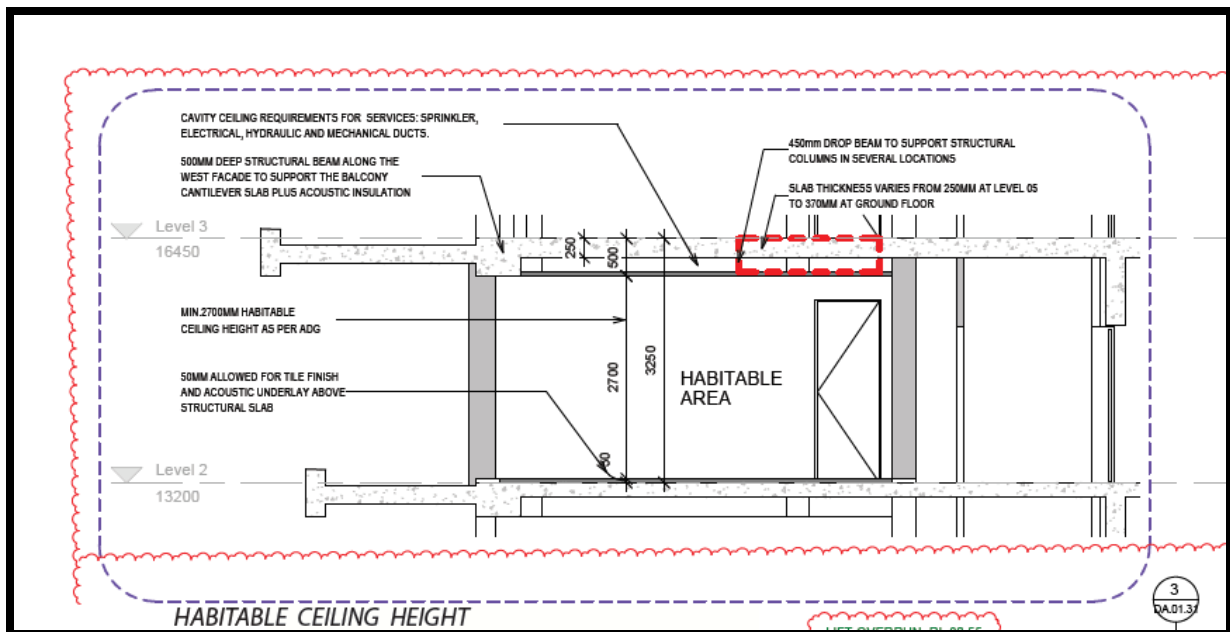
Section showing the proposed floor to floor and floor to ceiling heights within the building (courtesy: Drew Dickson Architects)
